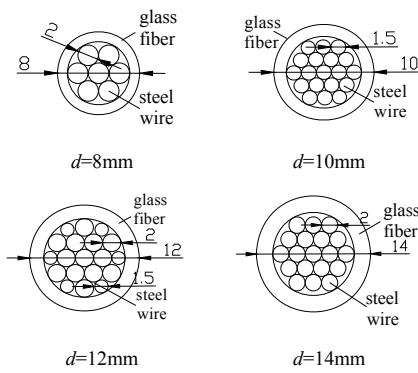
Schematic of cross section of GFRP/steel wire composite rebars
